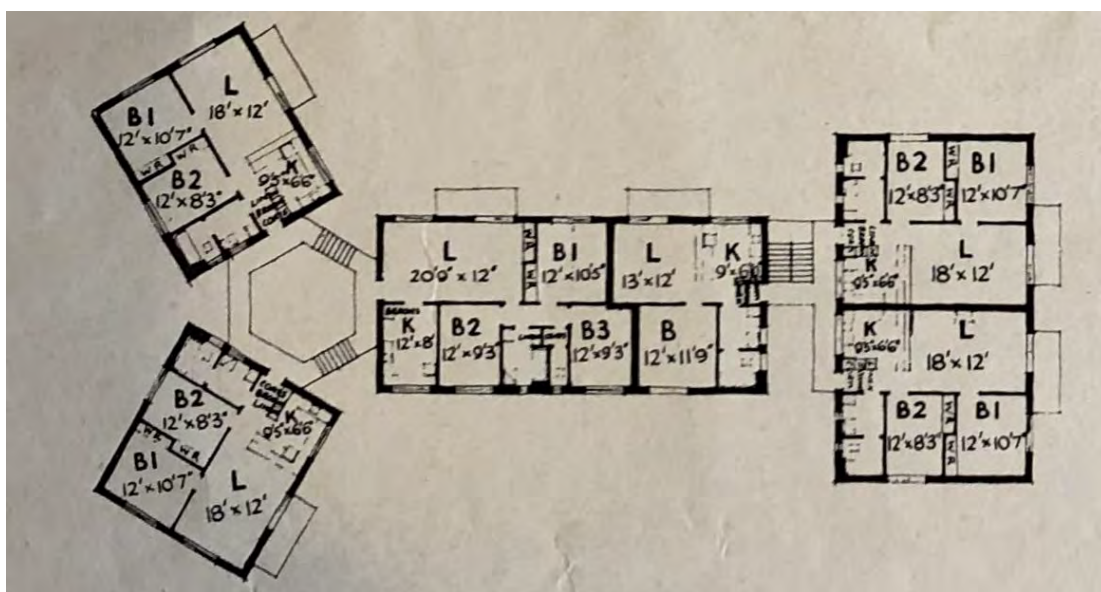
Floor plan layout of the six flats in each cluster of the first stage of Hotham Gardens
